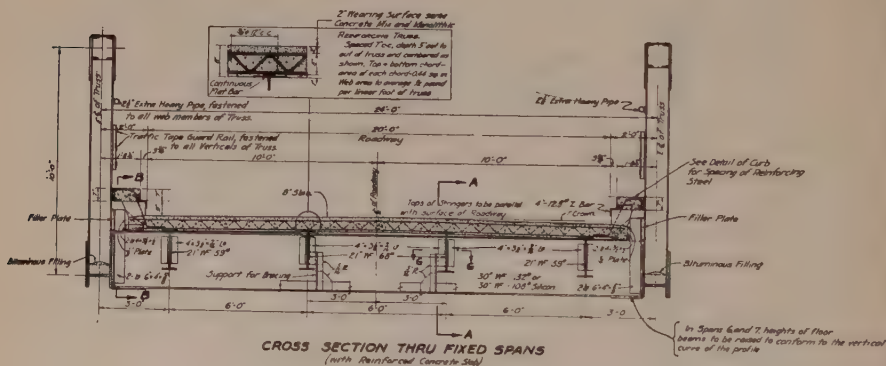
CROSS SECTION THROUGH FIXED SPANS
